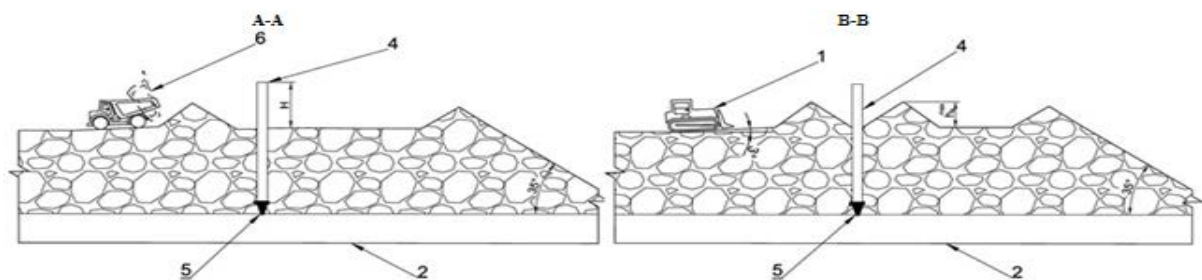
Layer high buildup with laying of vertical supports system pattern: 1. – earthmover; 2. - horizontal working support; 4 – vertical working support; 5. – vibration drop-hole; 6. – dumptruck
